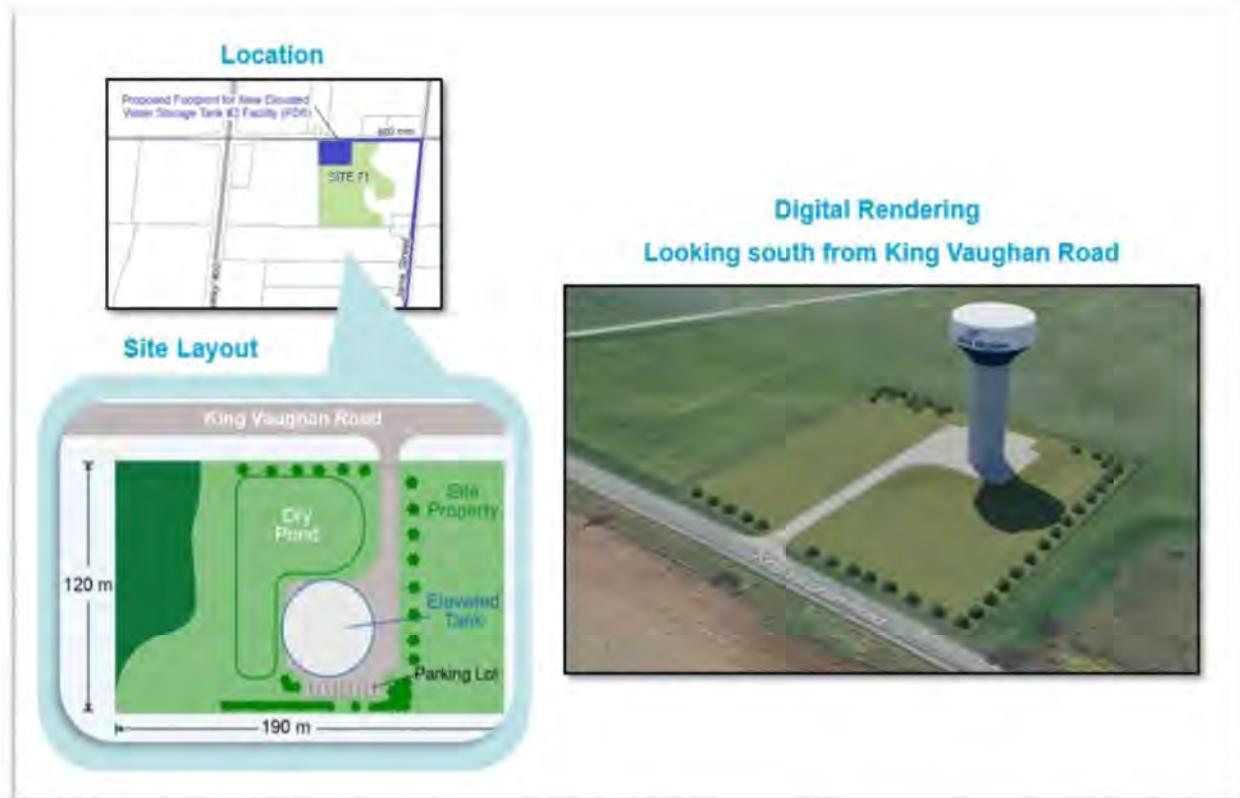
Proposed Location, Site Layout and Rendering of the Pressure District 8 Second Elevated Tank at Site 71
